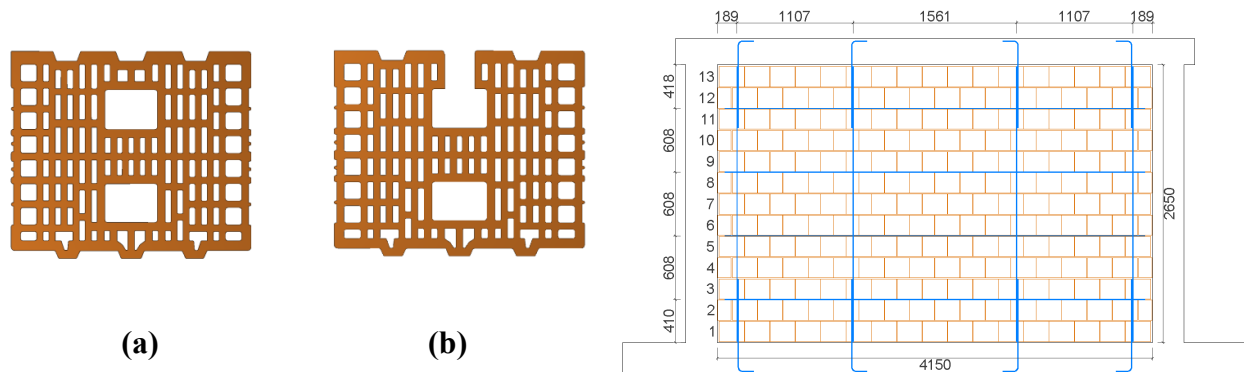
Unit and reinforced masonry system adopted in the experimental campaign.
